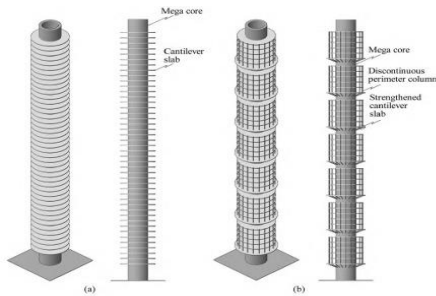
Slabs in the mega core system: (a) cantilever slab, (b) supported cantilever slab
